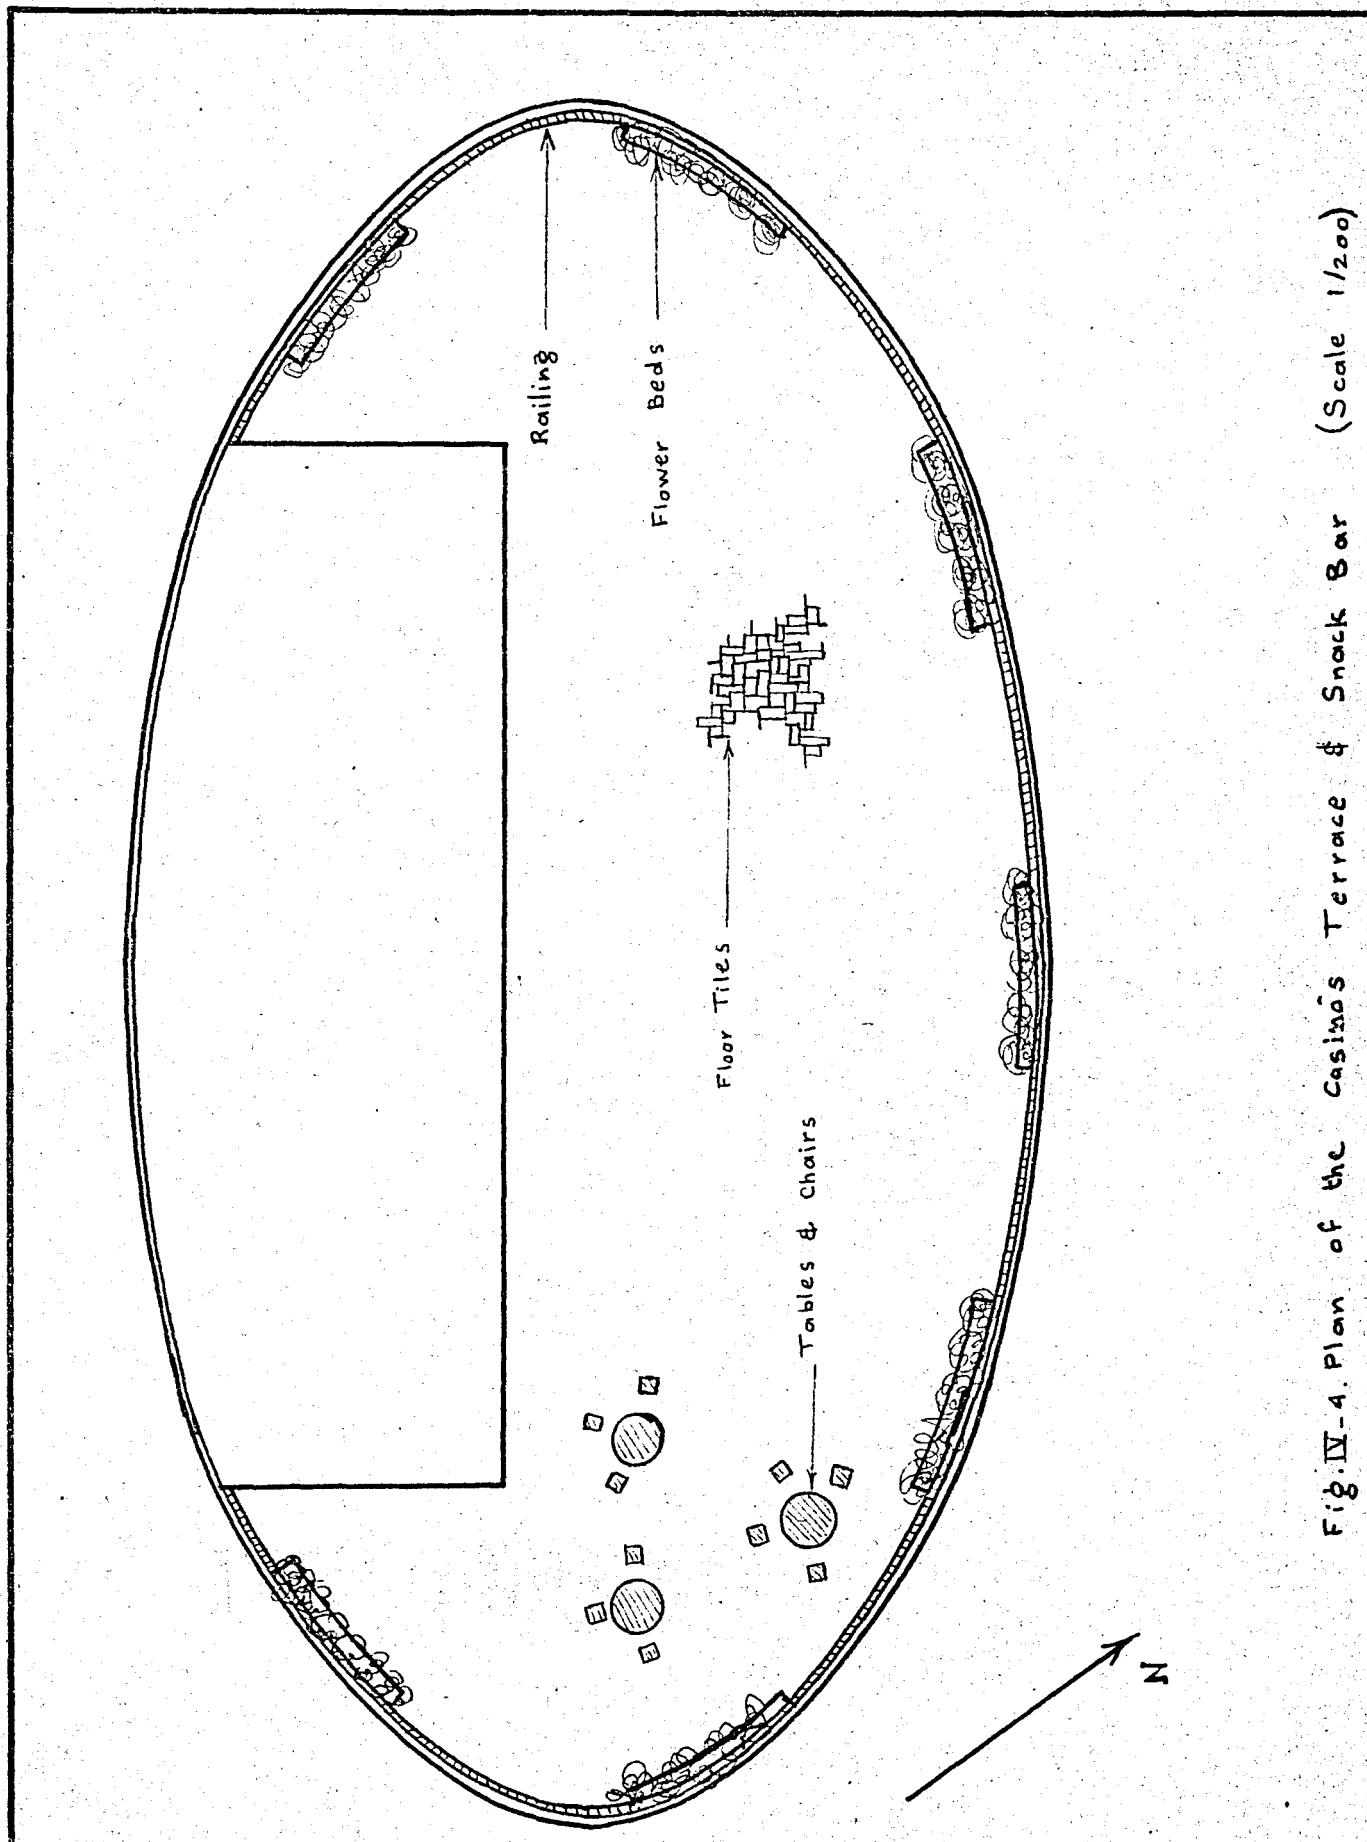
Plan of the Casino's Terrace & Snack Bar (Scale 1/200)
